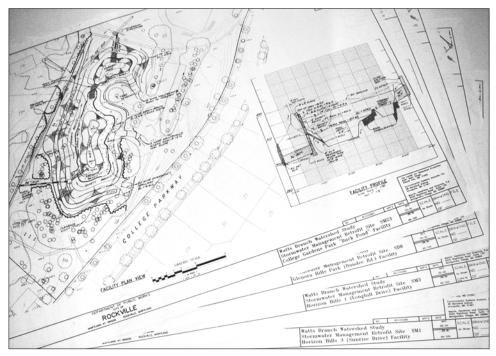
Watts Branch Duck Pond retrofit facility plan view
